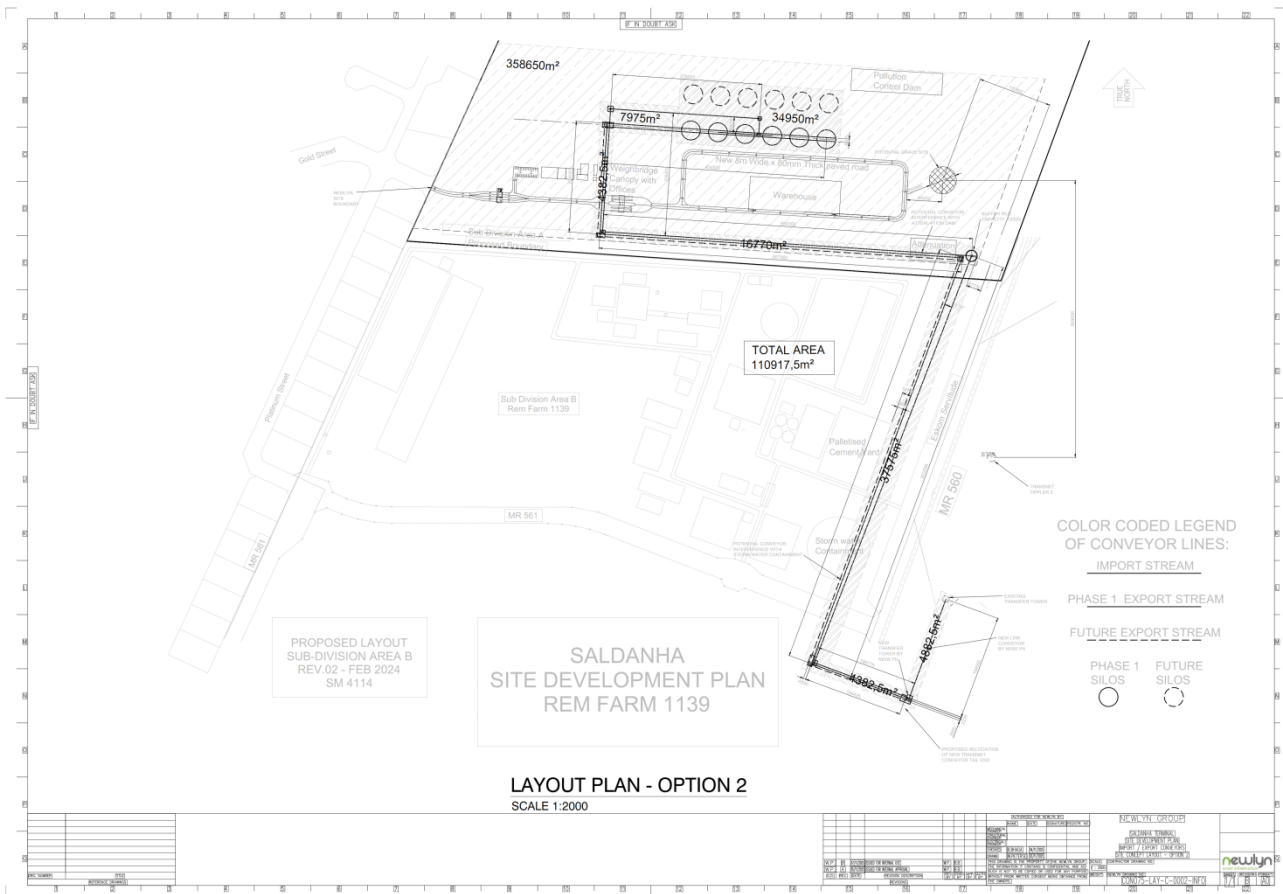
The proposed site layout and site access off Platinum Street on the western boundary of RE/1139
